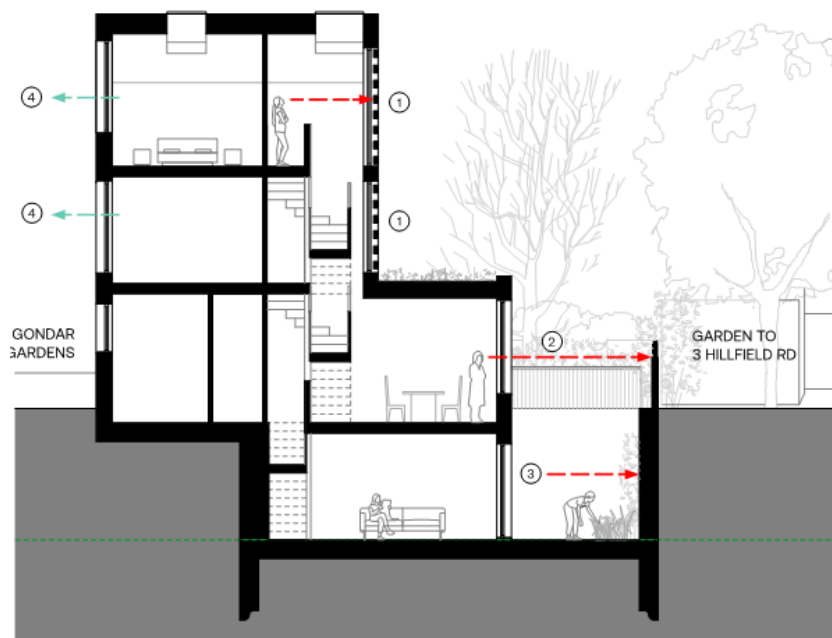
(left): Diagrammatic section to show how the scheme avoids overlooking. No windows proposed on upper levels of side walls, with the habitable rooms at this level facing the front/street. Upper level windows facing rear gardens would be obscured or covered with a brick screen. Boundary walls would prevent overlooking from basement and ground floor levels.
